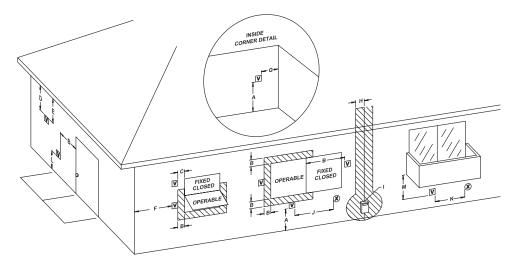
Minimum Clearances from Vent/Air Inlet Terminations – Indoor and Outdoor Installations
